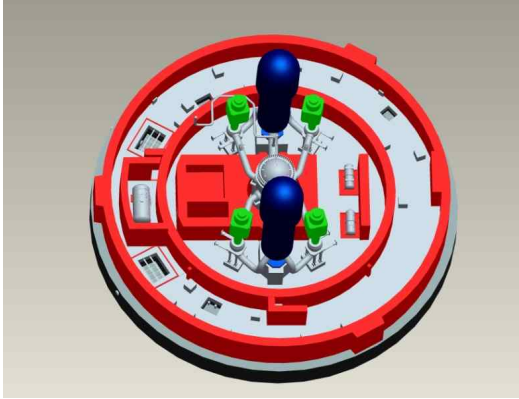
3D CAD drawing of OPR-1000 plant containment floor (EL. 86 ft)
